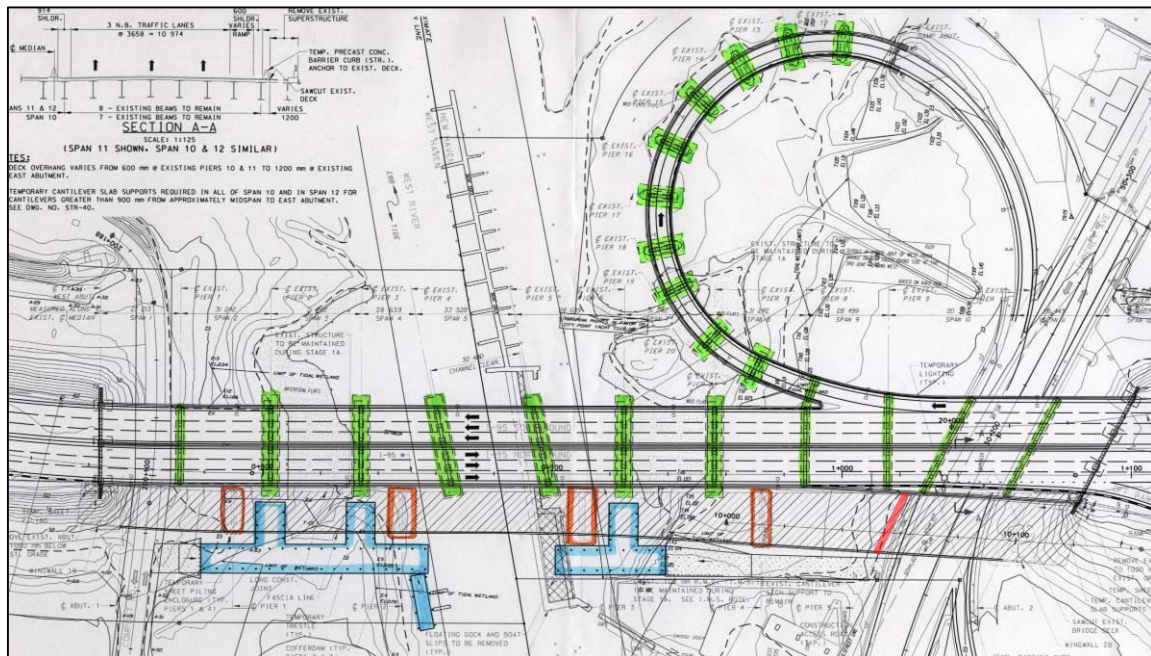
Construction Stage 1A. Existing piers are shown in green, cofferdams are shown in orange, trestles are shown in blue, and replacement Pier 5 is shown in red
